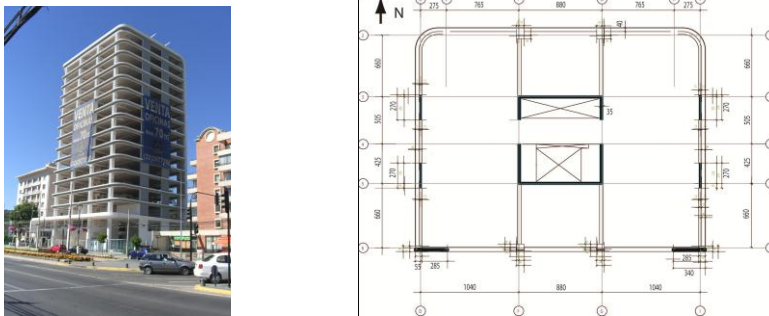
Left: General picture of the building. Right: Typical plan view shows distribution of shear walls and columns as well as dimensions and the axes system.
